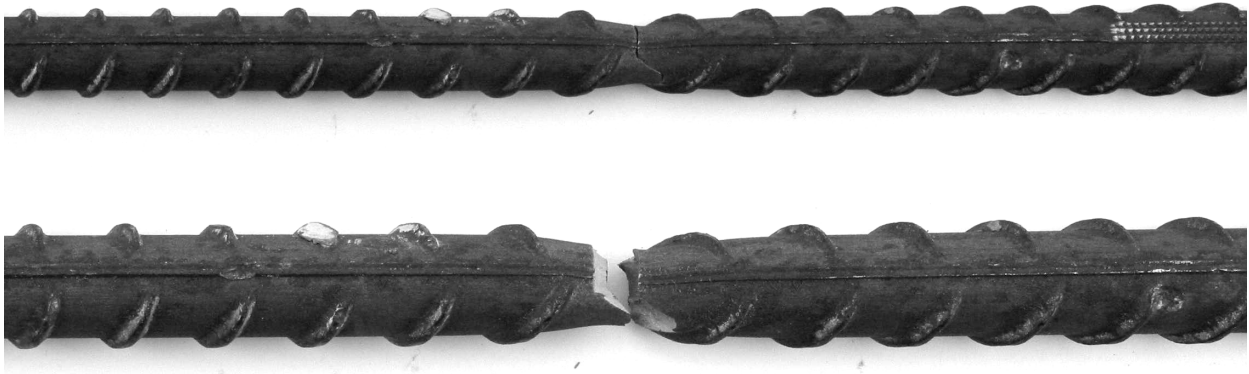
Example of post failure condition for a tested 16 mm rebar (bar no. 16-4).
